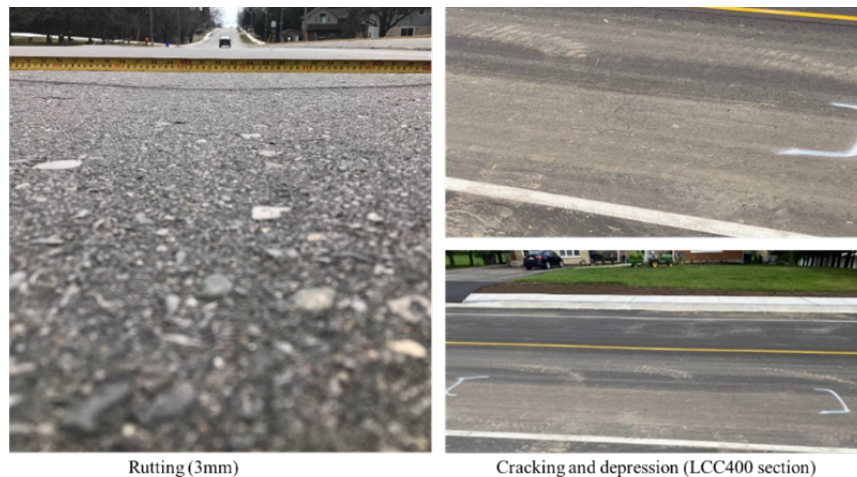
Cracking in LCC400 section asphalt layer
